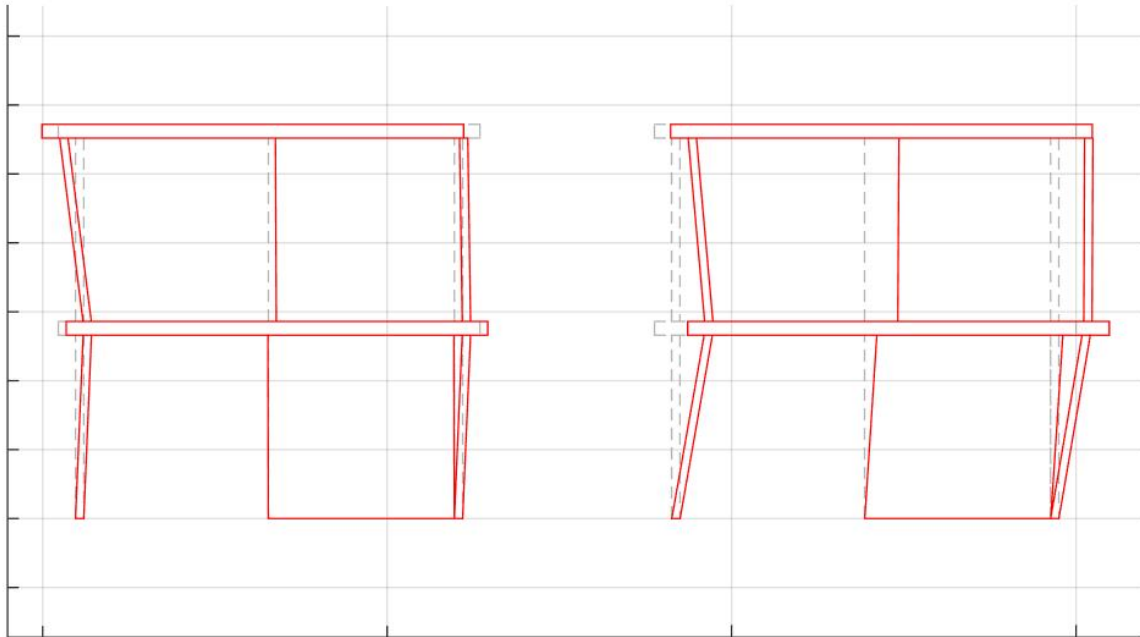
Deformed shape of EUC-BUILD4 specimen (max and min) – Test run #7.
